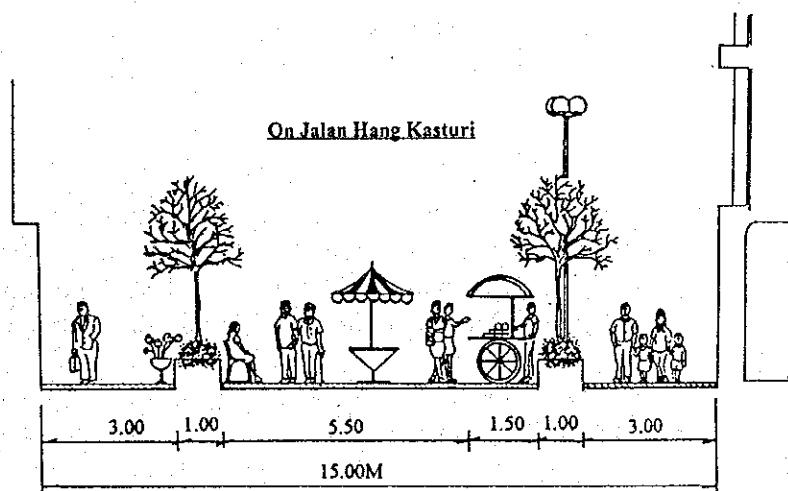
Concept on a Cross Section of a Pedestrian Road
